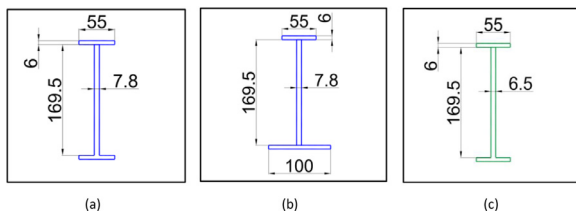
Dimensions of the (a) storey column, (b) bottom storey column, (c) damaged column.
